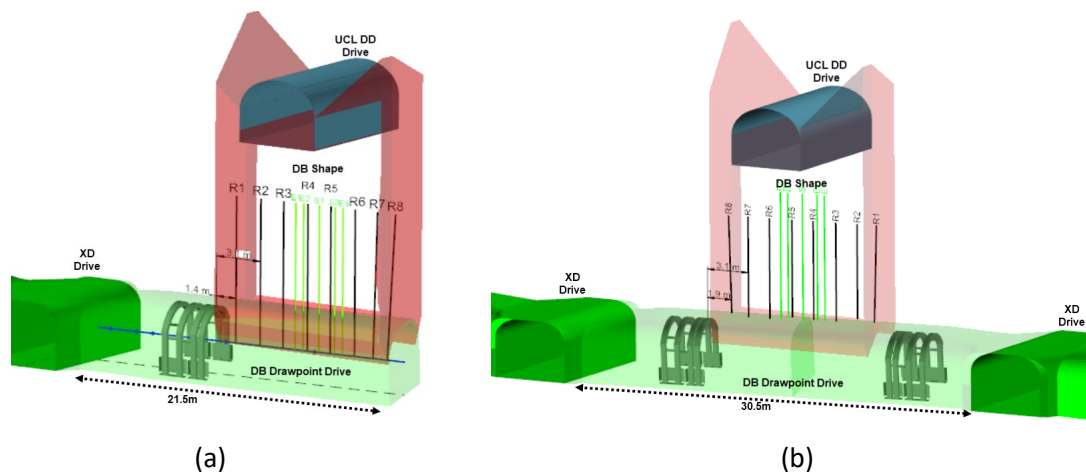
(a) Oblique view of P0 single-sided drawbell; (b) Oblique view of P0 two-sided drawbell
